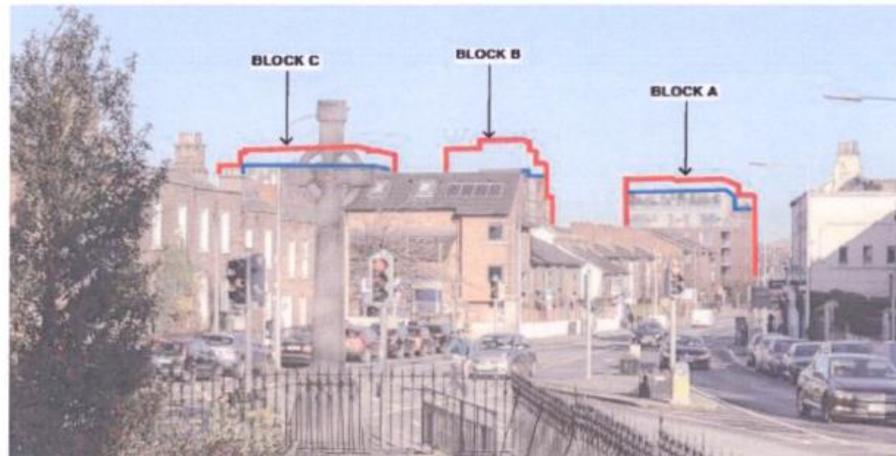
View of current LRD proposal when viewed looking north from Harold's Cross Park.
